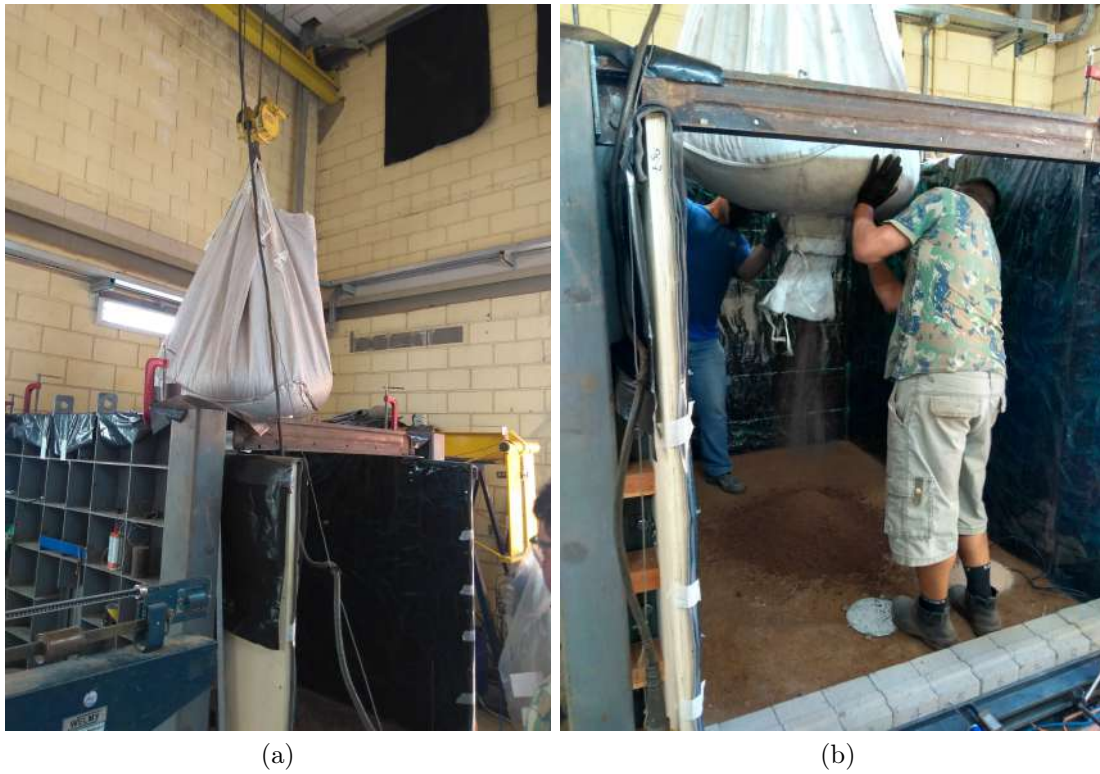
Soil being placed at the test facility with a bag and a travelling crane.
